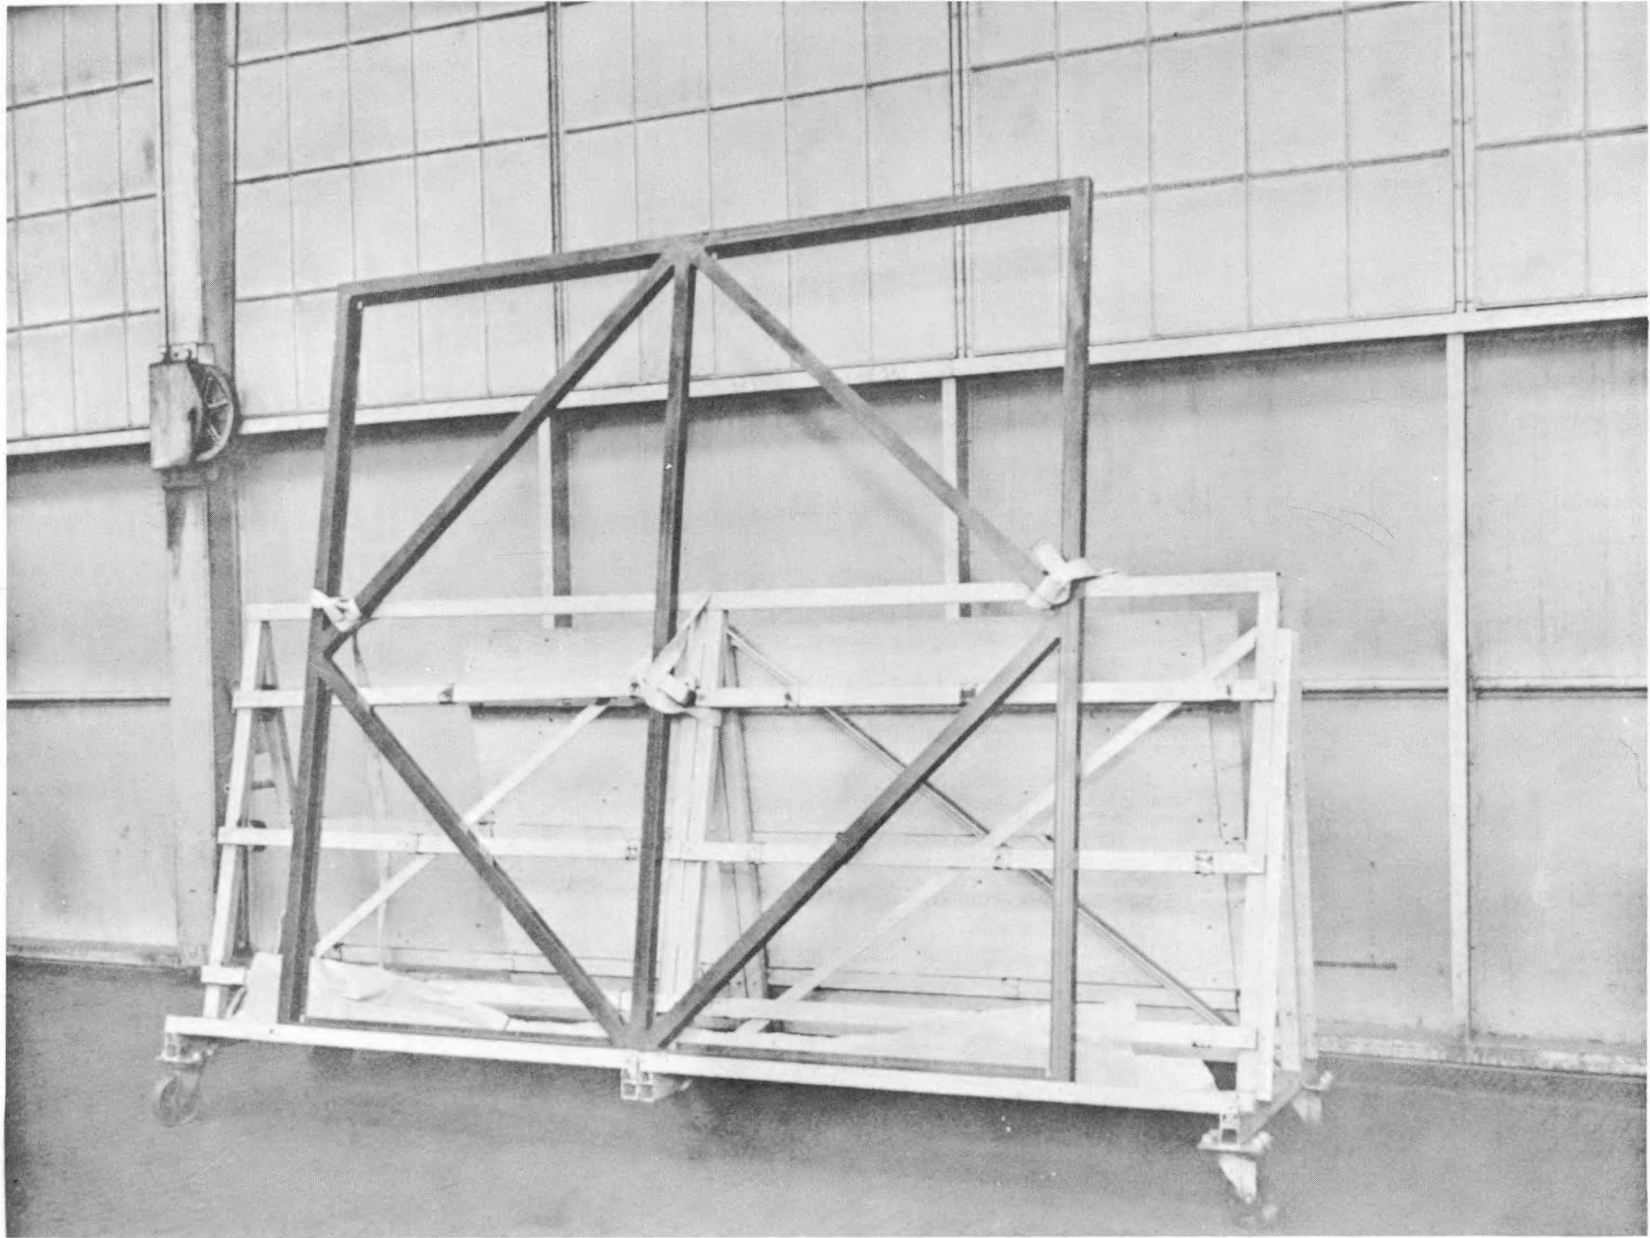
PM-1 Truss Package--View of Completed End Truss
